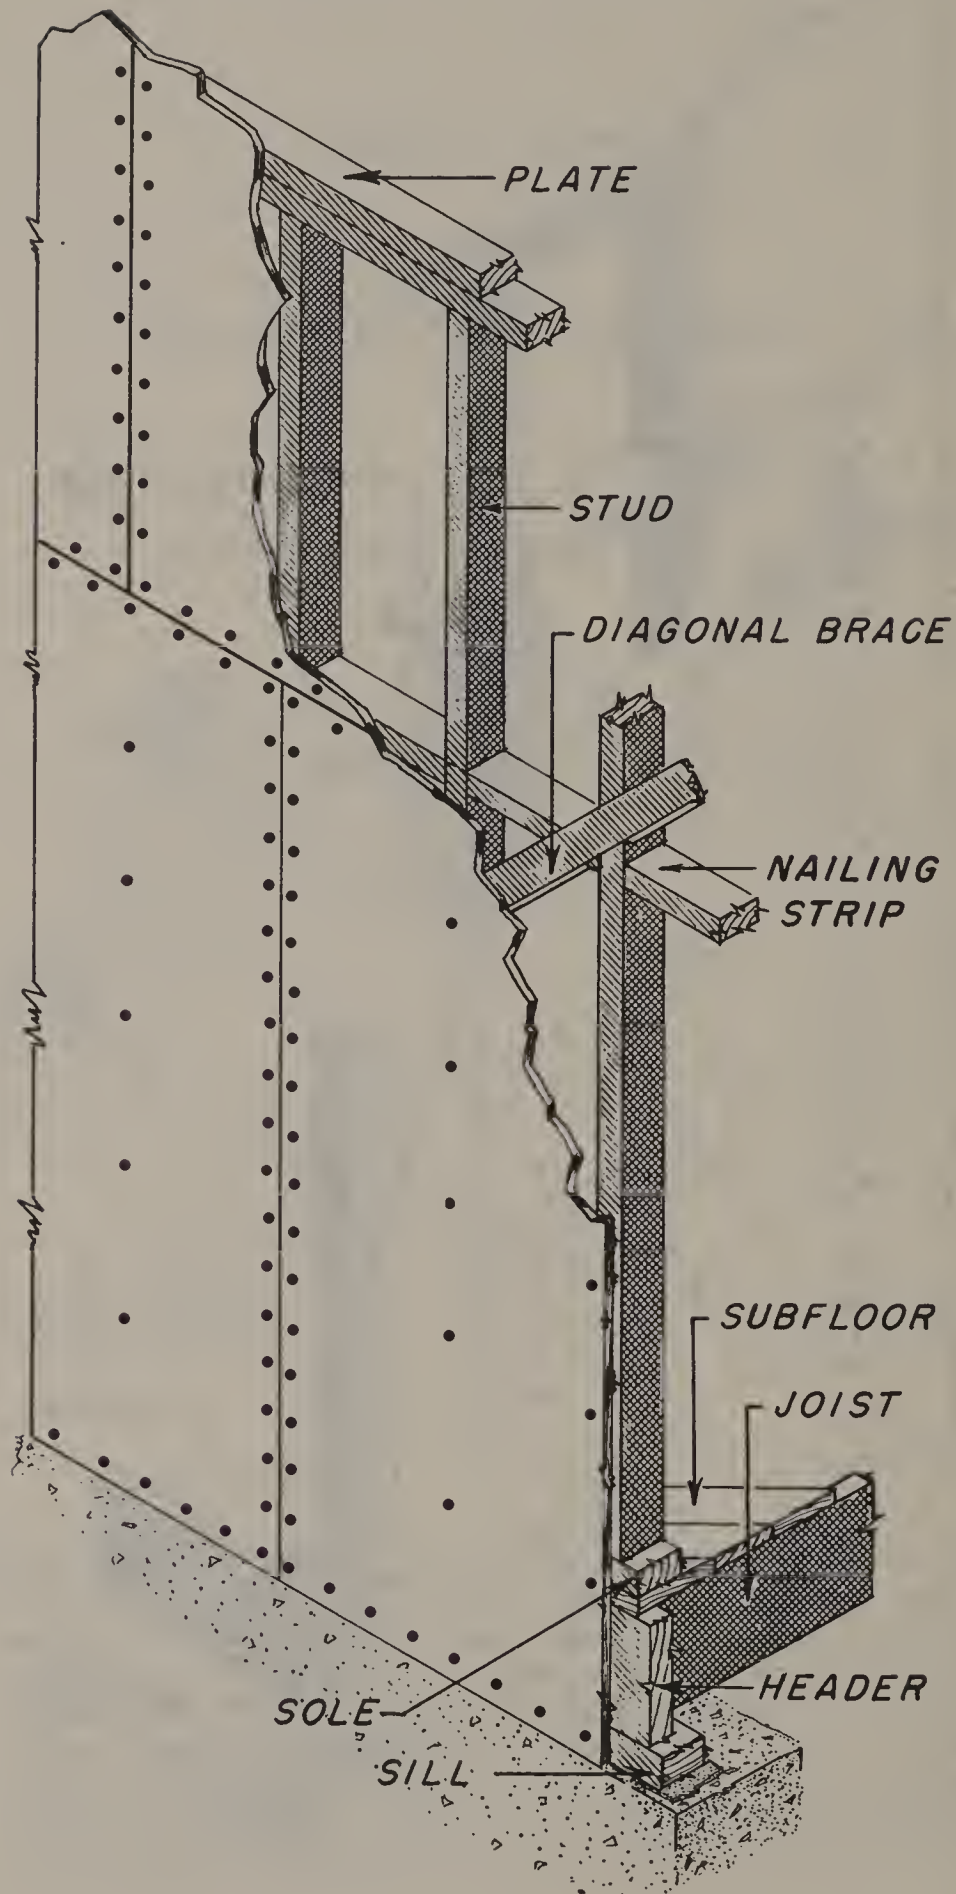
Fiberboard wall sheathing. Nail with eight-penny rust-resisting nails spaced 6 inches around edges and 10 inches on intermediate framing members. Diagonal bracing nailed in accordance with figure 19. Note: Vertical joints between fiberboard sheets should not be on the same stud or joist in succeeding rows of sheathing. To receive the nails at the horizontal joints, nailing strips are set between the studs or joists and nailed to them.
